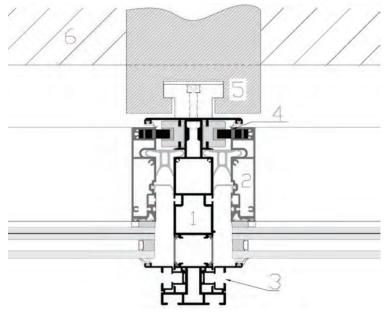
1) façade bracket, 2) fall protection fence attachment, and 3) bracket for climbing weather protection The horizontal cross section: 1) wind post, 2) façade unit, 3) guiding track, 4) bracket between façade unit and wind post, 5) façade bracket, and 6) floor slab (Source: Brunkeberg Systems)
